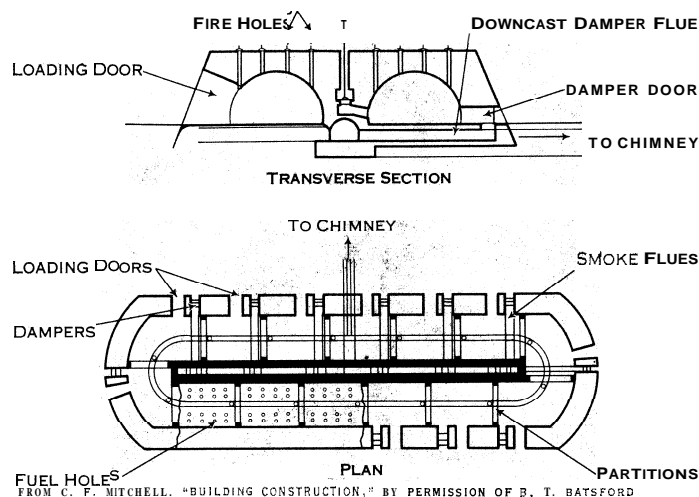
PLAN AND CROSS SECTION OF A HOFFMANN KILN
